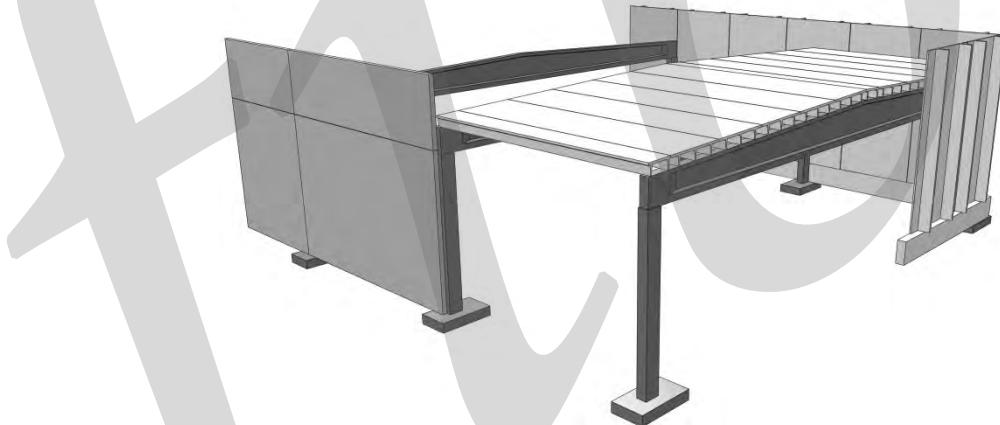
Precast portal frame system with columns and prestressed rafters
